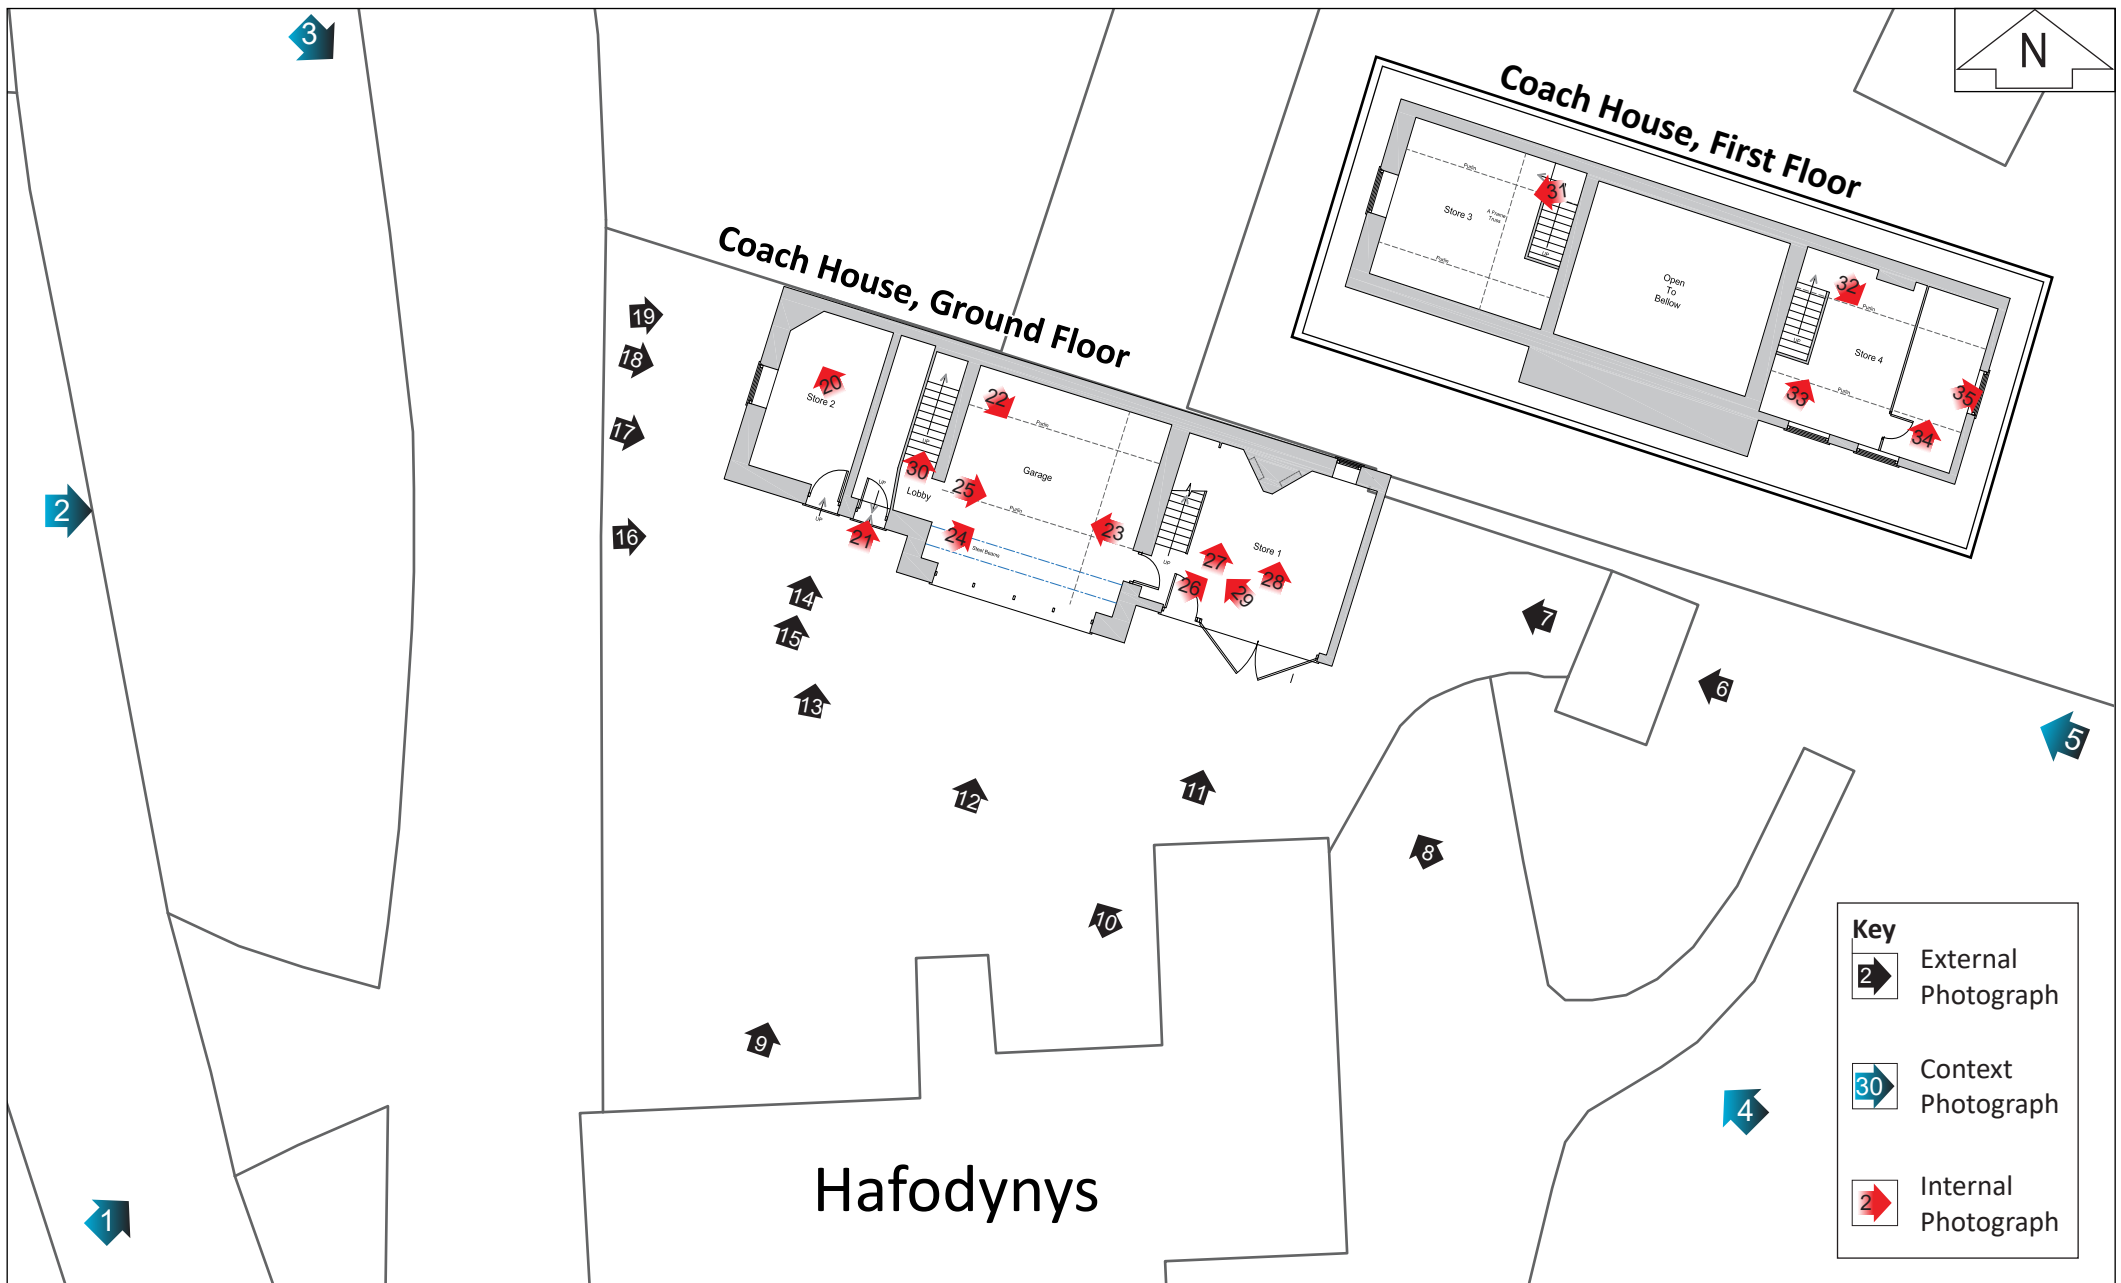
Figure showing location of archaeological plates taken, overlaid onto a ground floor & first floor plan of the former Coach House at Hafod Ynys, Rhewl, Denbighshire LL15 1UL. Scale 1:200 @ A4.
